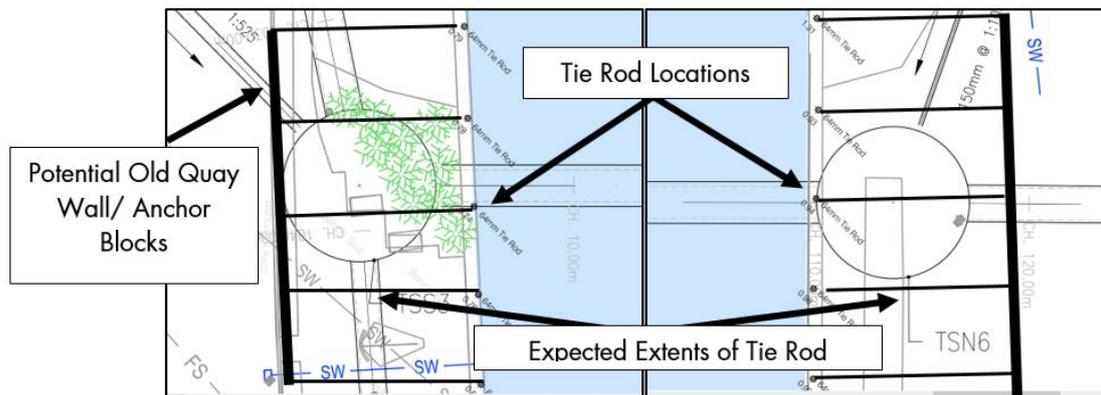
Indicative layout of existing infrastructure at the river crossing
